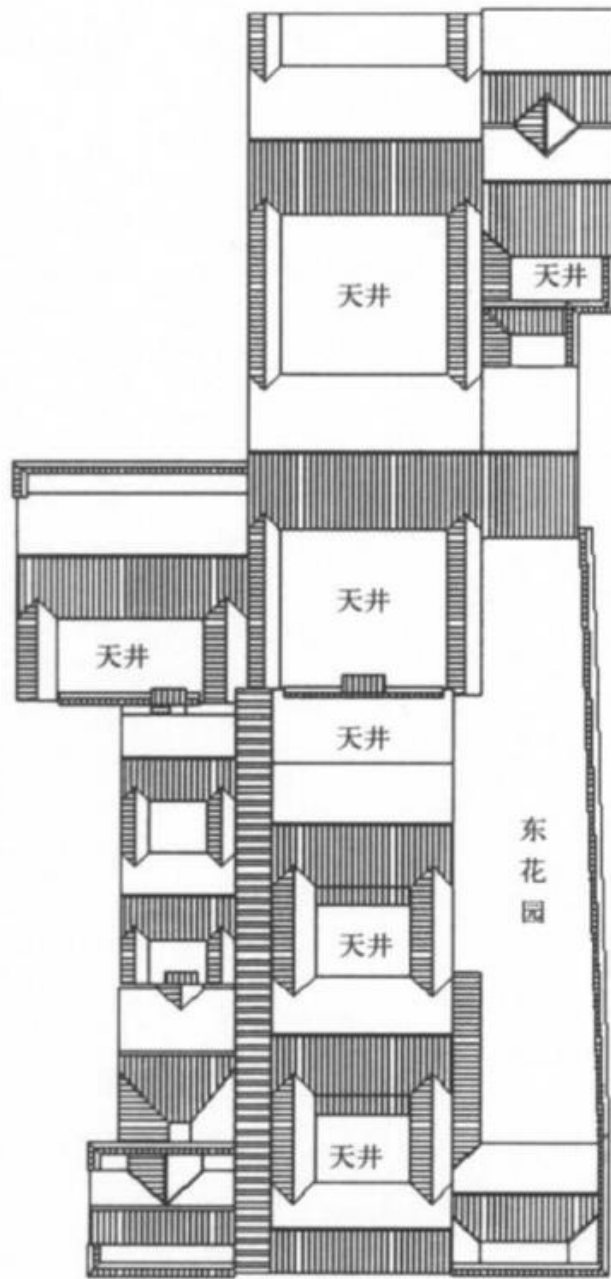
Floor Plan of Plan of Former Residence of PAN Zuyin (Source: Yuan Zong, 2006)
